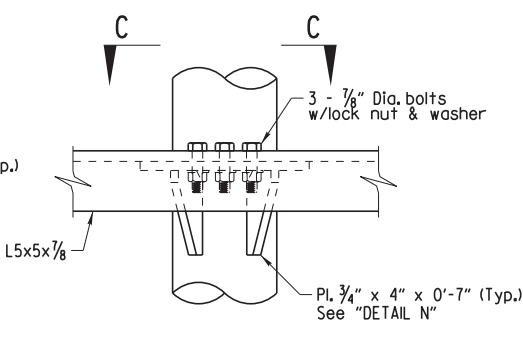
DETAIL OF SIGN SUPPORT CONNECTED TO TRUSS
